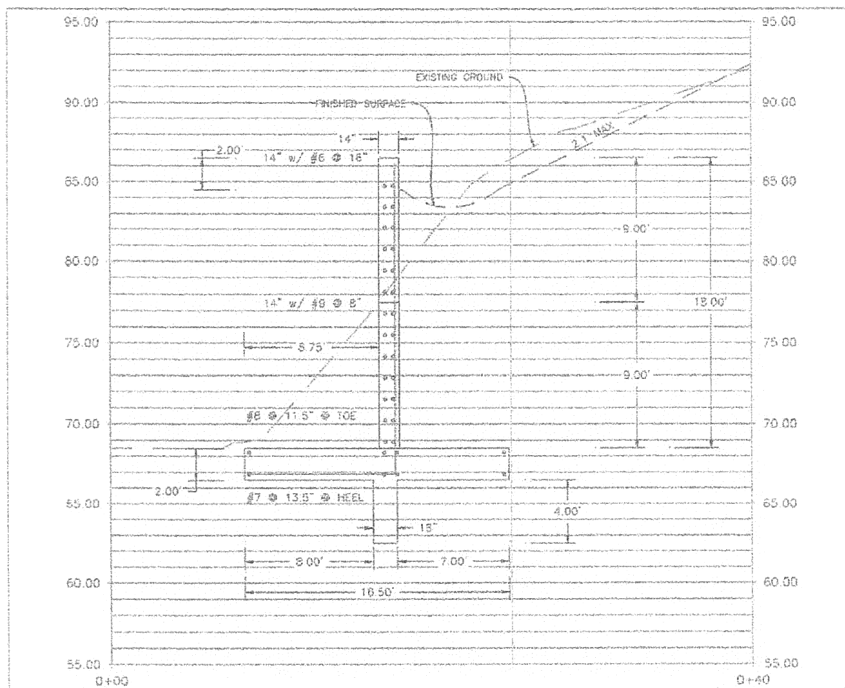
Proposed cantilever retaining wall location relative to existing structures.
